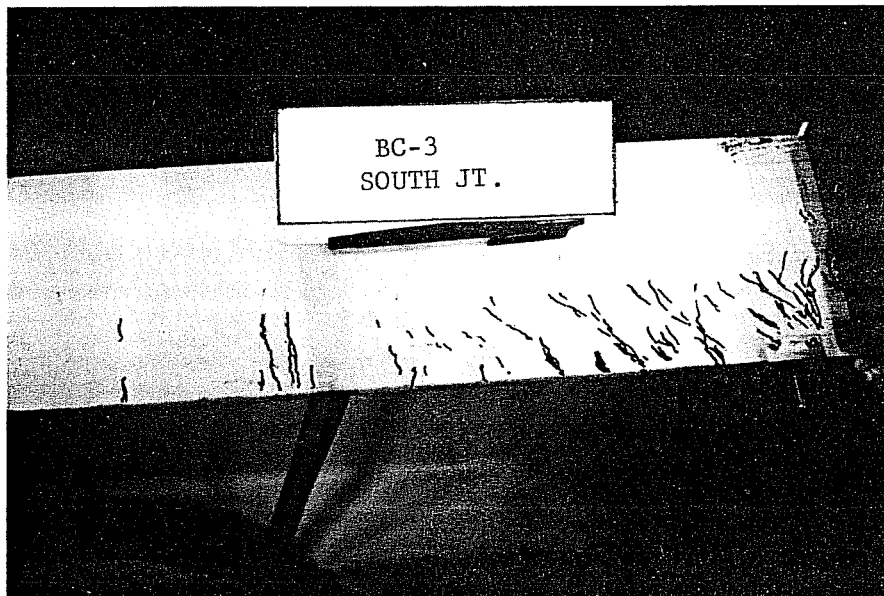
Yielded zone at south joint after failure, Specimen BC-3
